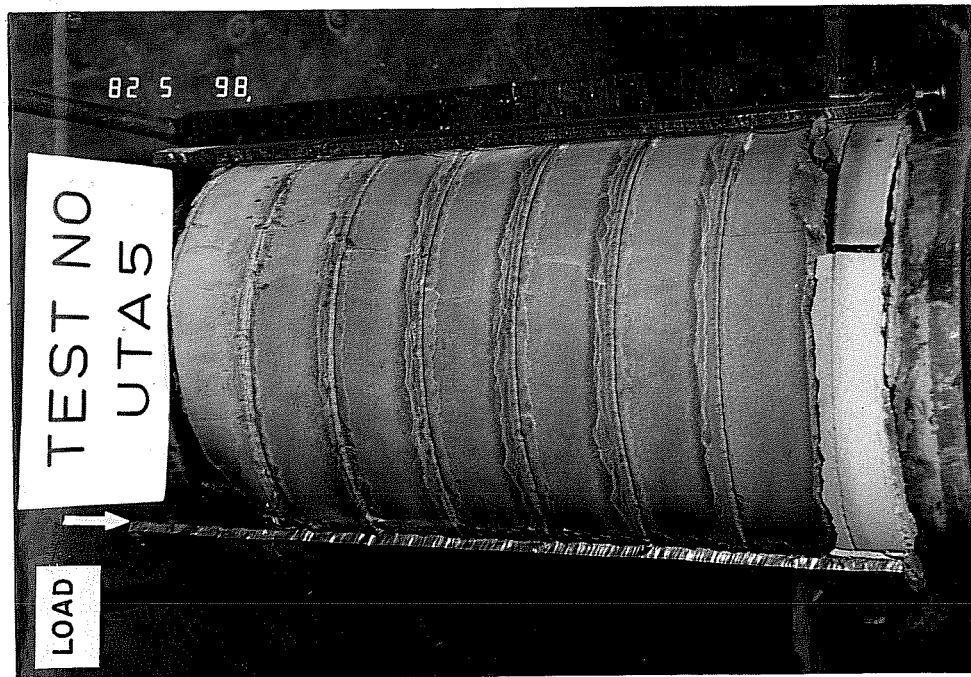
Grout surface on sleeve side for Specimen UTA5
